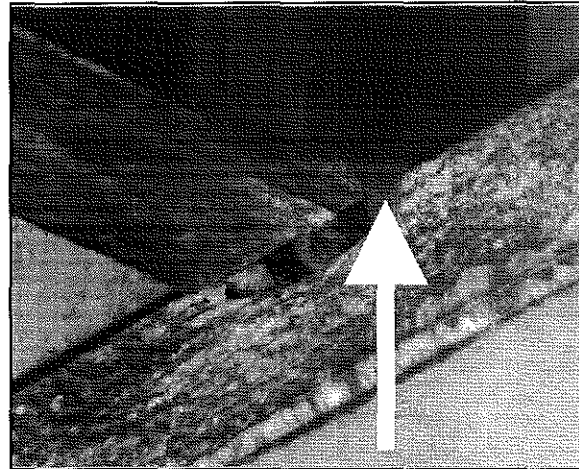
Concrete Spalling at Diaphragm-Girder Interface.
